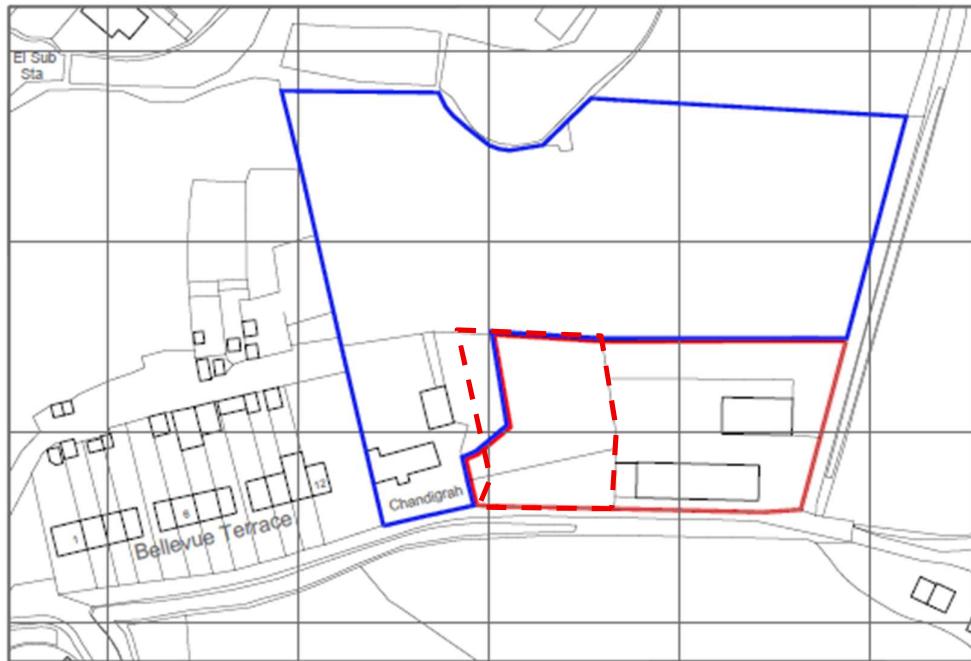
Extract from drawing no: 1682/OS-01 approved CLEUD site location plan with current proposed site plan shown in dashed red outline. The site has subsequently been divided
